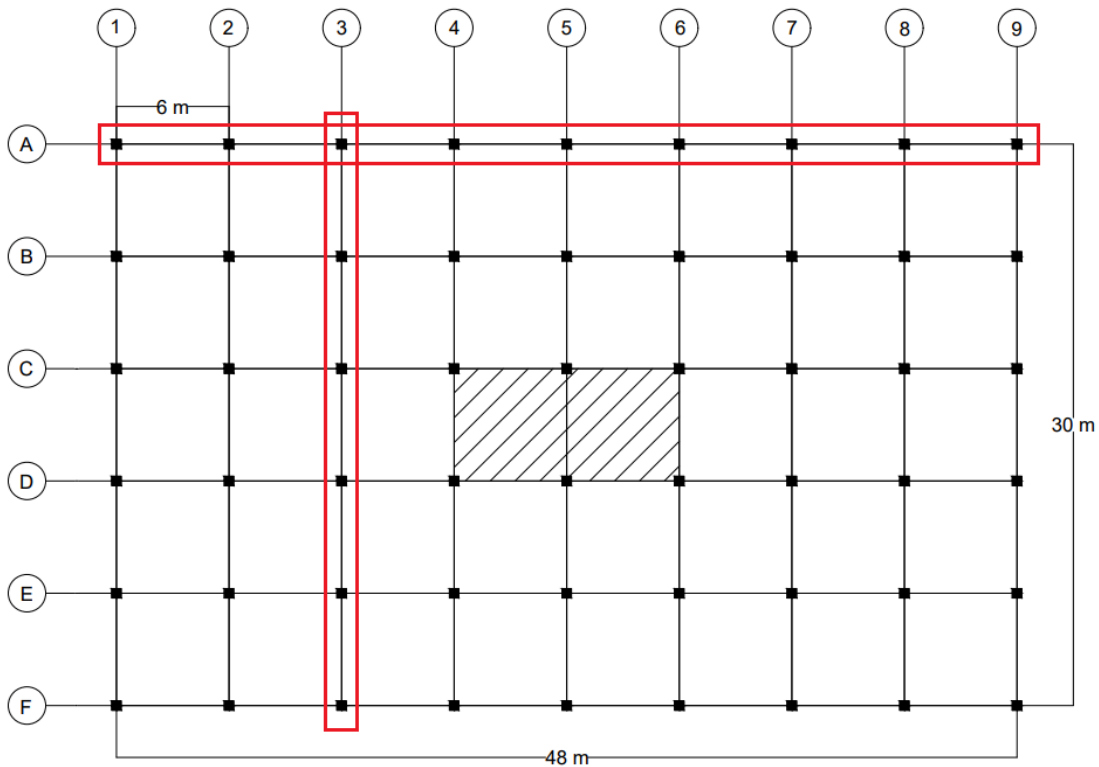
Structural layout with the chosen Frame A and Frame 3
